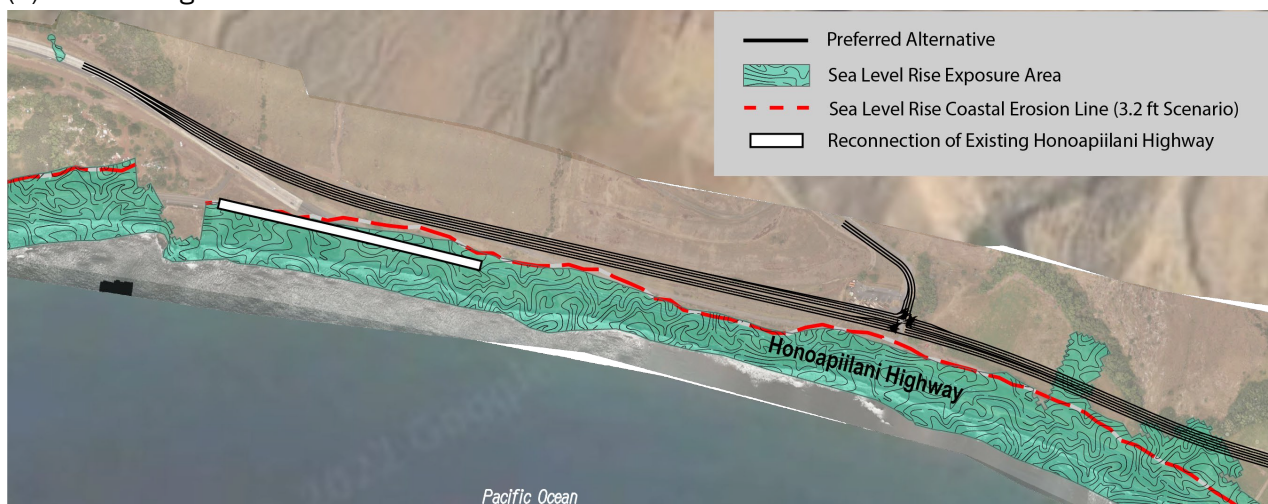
Olowalu – Draft EIS Refinement at Northern Connection to Existing Lāhainā Bypass
